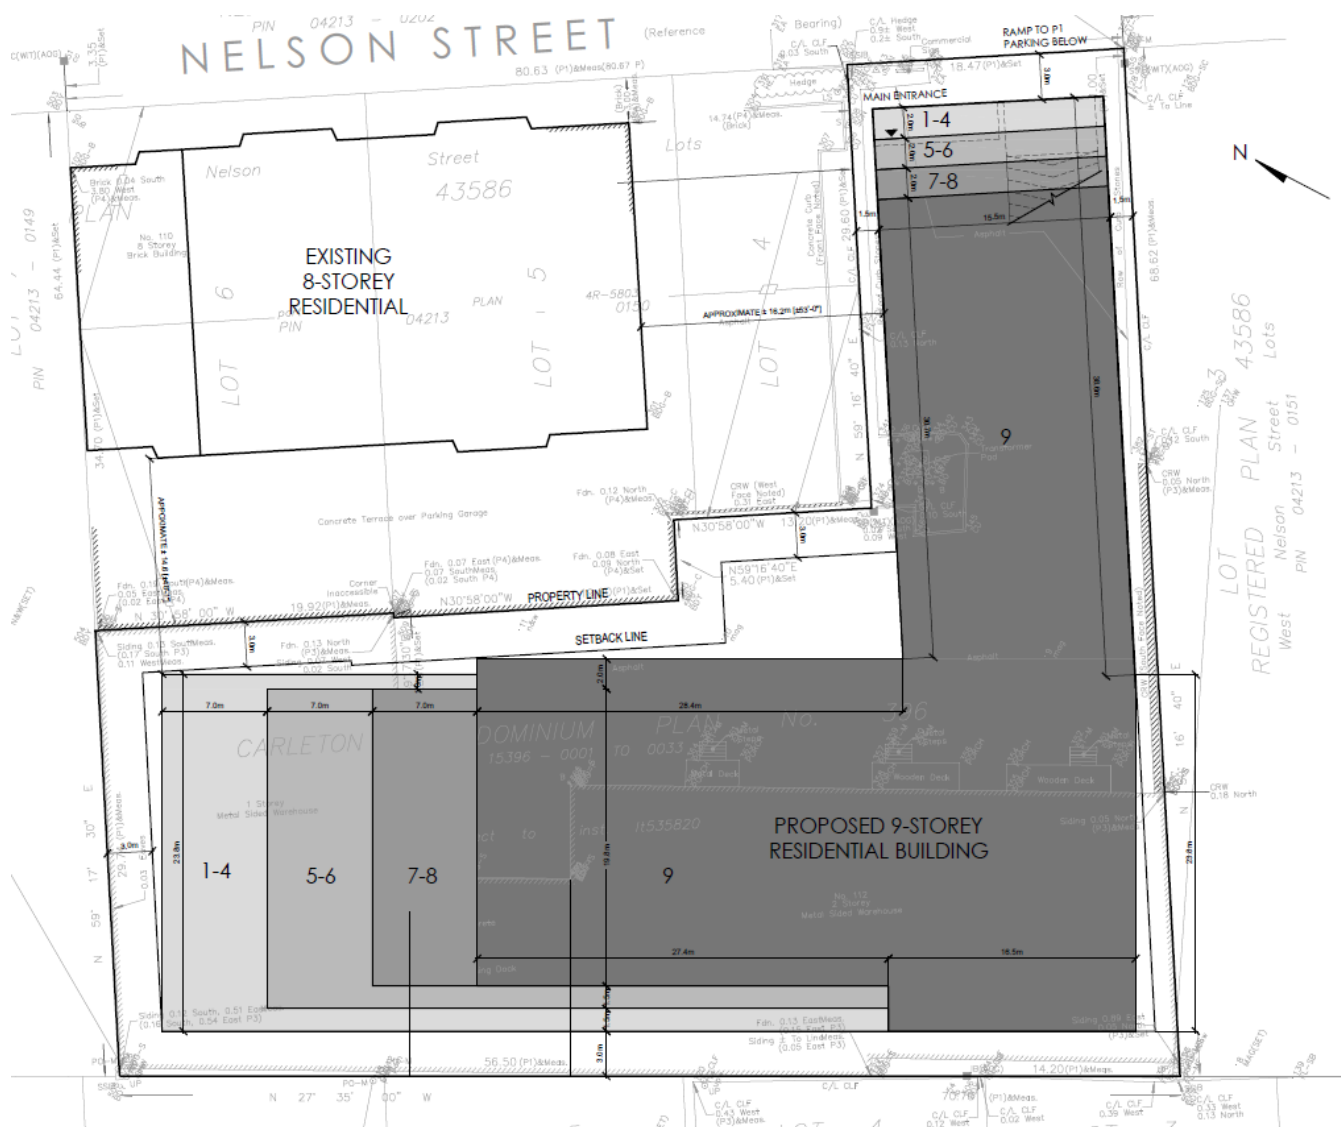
Snapshot of the Concept Site Plan showing Building Setbacks and Stepbacks
